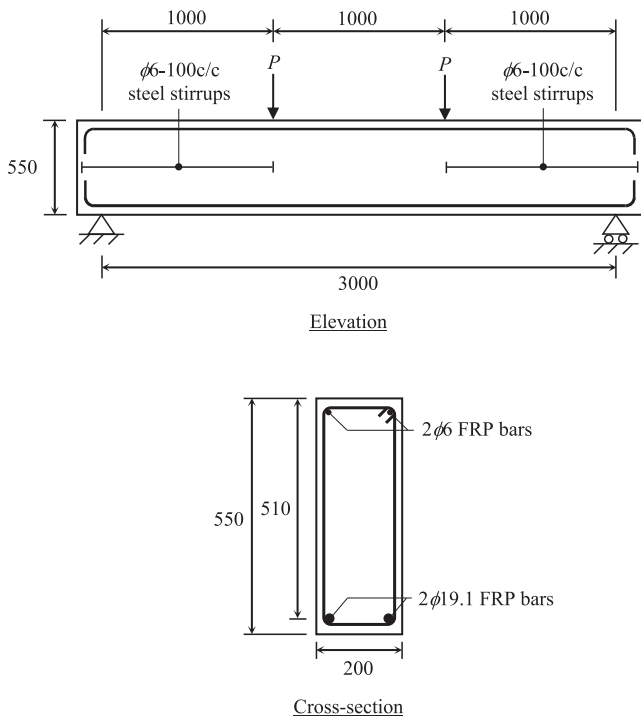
Layout of beam ISO3 (dimensions in mm).
